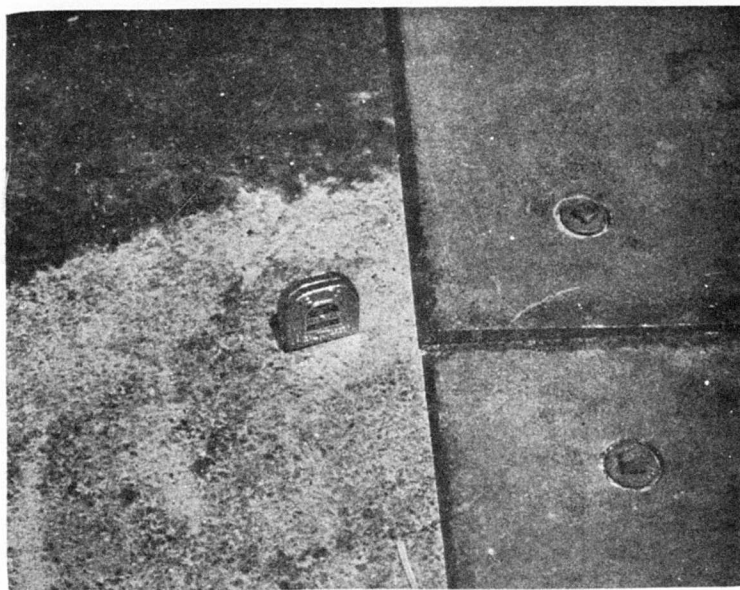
Test 1-1, Mismatch of AM-2 Airfield Patch Ramp Sections Due to Crown in Runway
